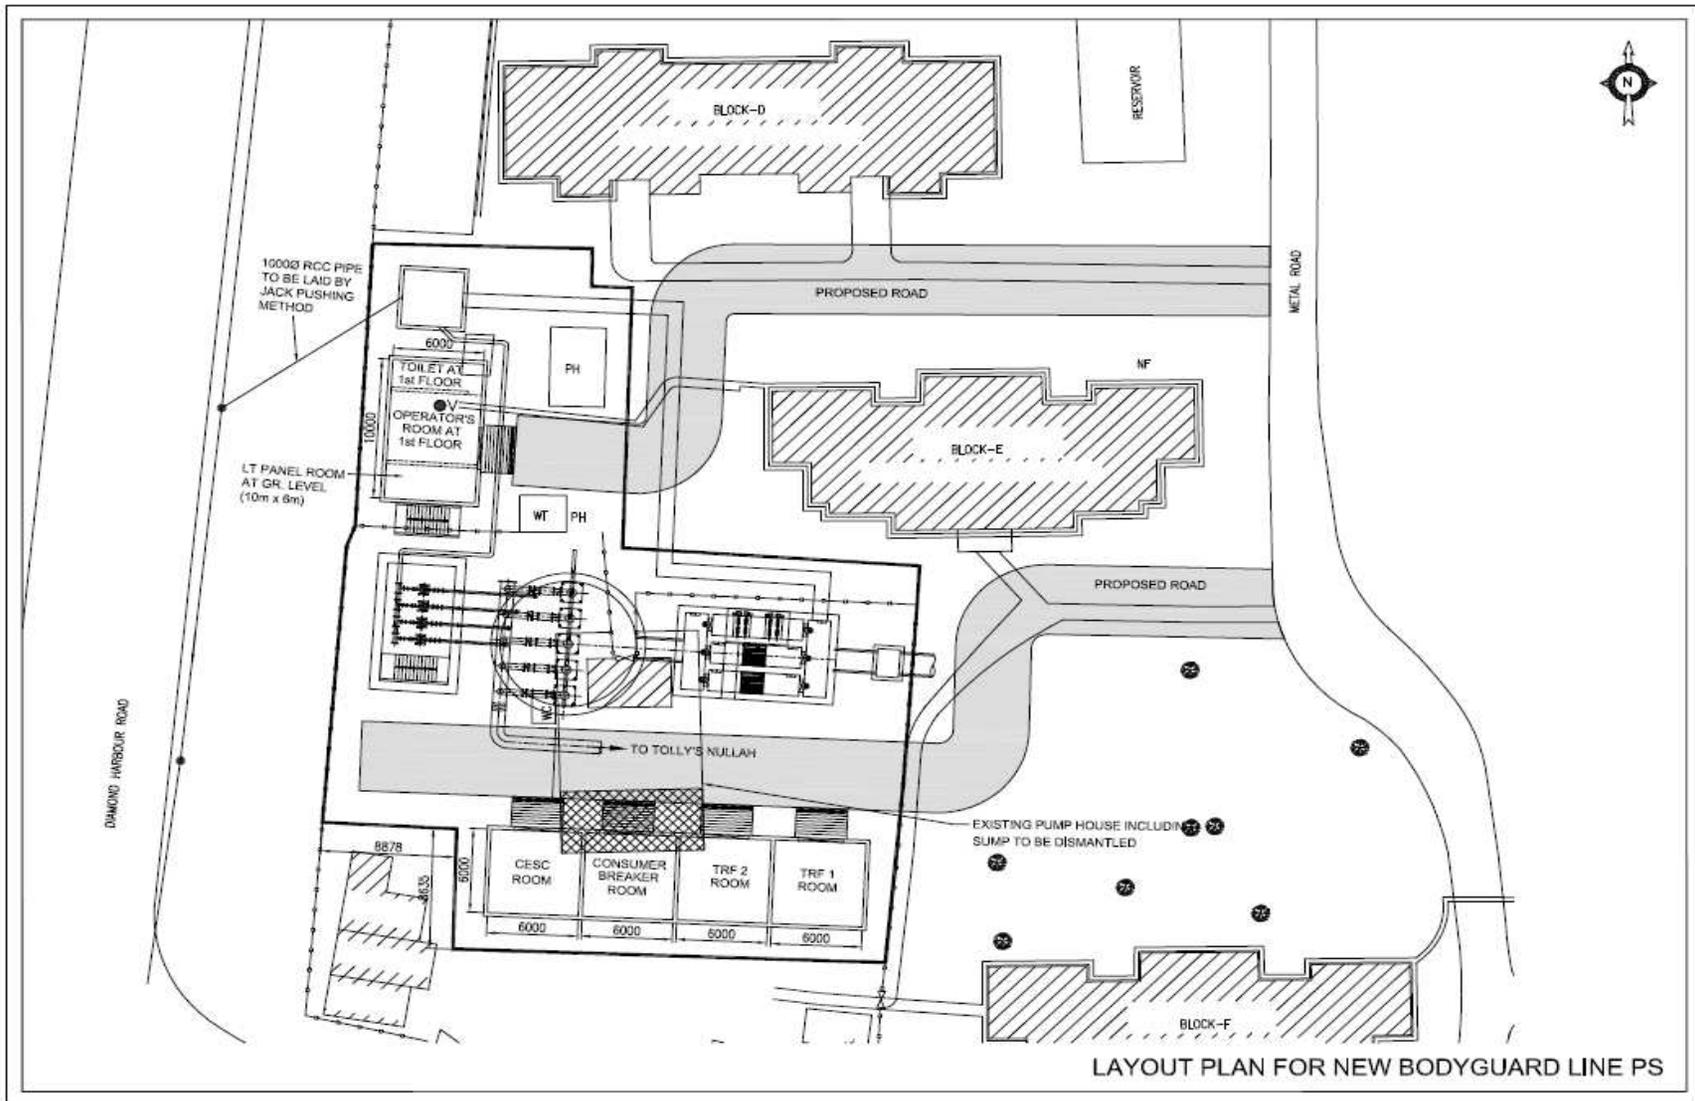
Layout Plan for New Body Guard Line Pumping Station
